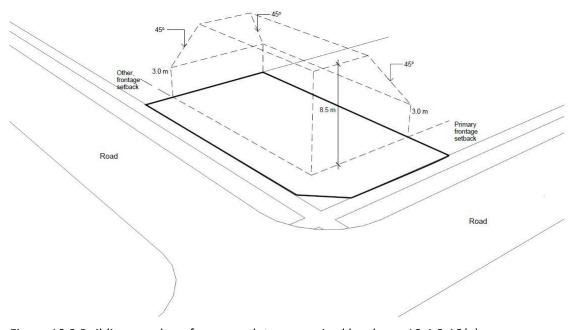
Building envelope for corner lots as required by clause 10.4.2 A3(a)
